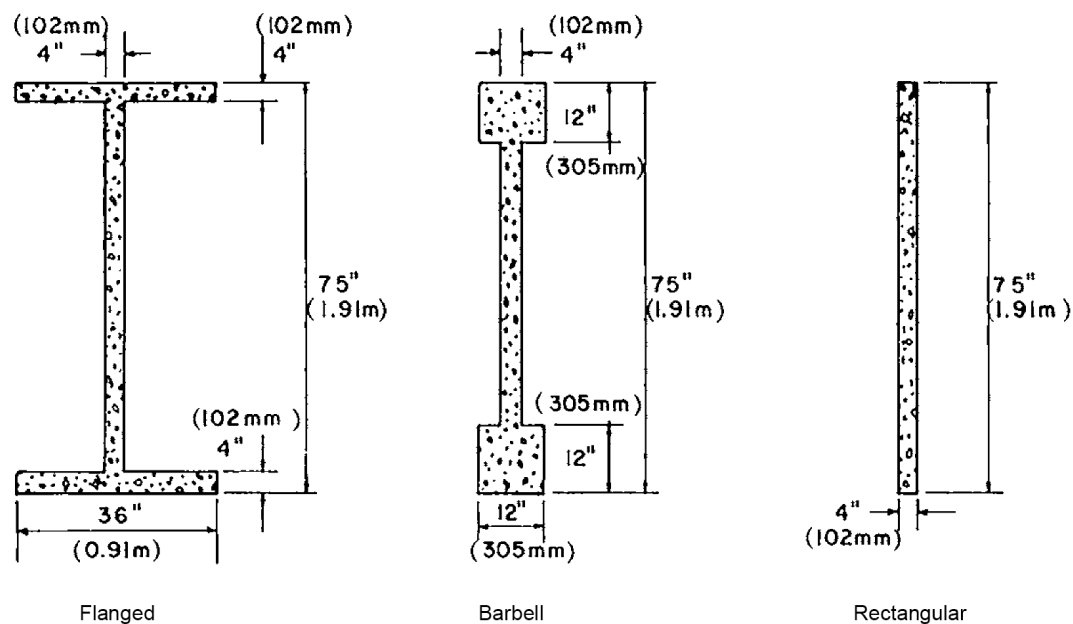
Shapes of shear wall cross-sections (Corley, Fiorato, and Oesterle, 1981).
